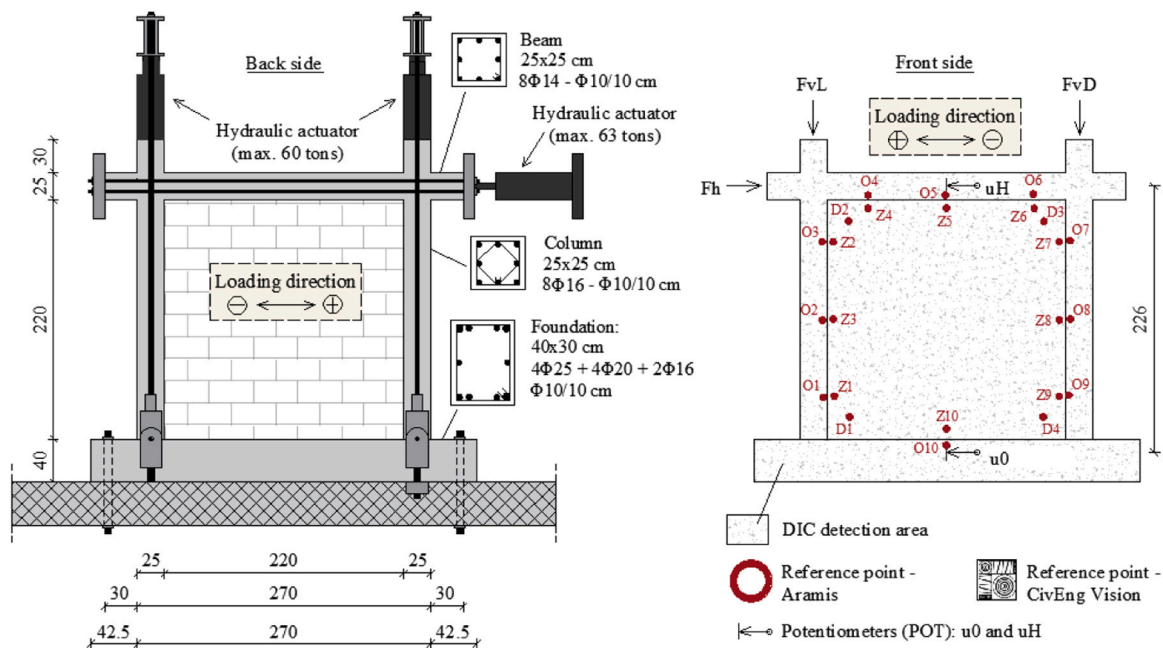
Back and front view of the RC frame with infill wall: dimensions in [cm], reinforcement details, test setup, DIC detection area and DIC reference points – the CivEng Vision were located at the whole surface every 20–30 cm (see Figs. 13b and 15b).
